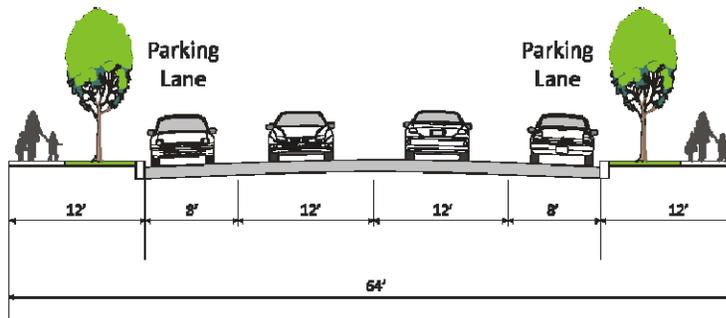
(2 OF 2): CITY OF COLTON GENERAL PLAN CROSS-SECTIONS
